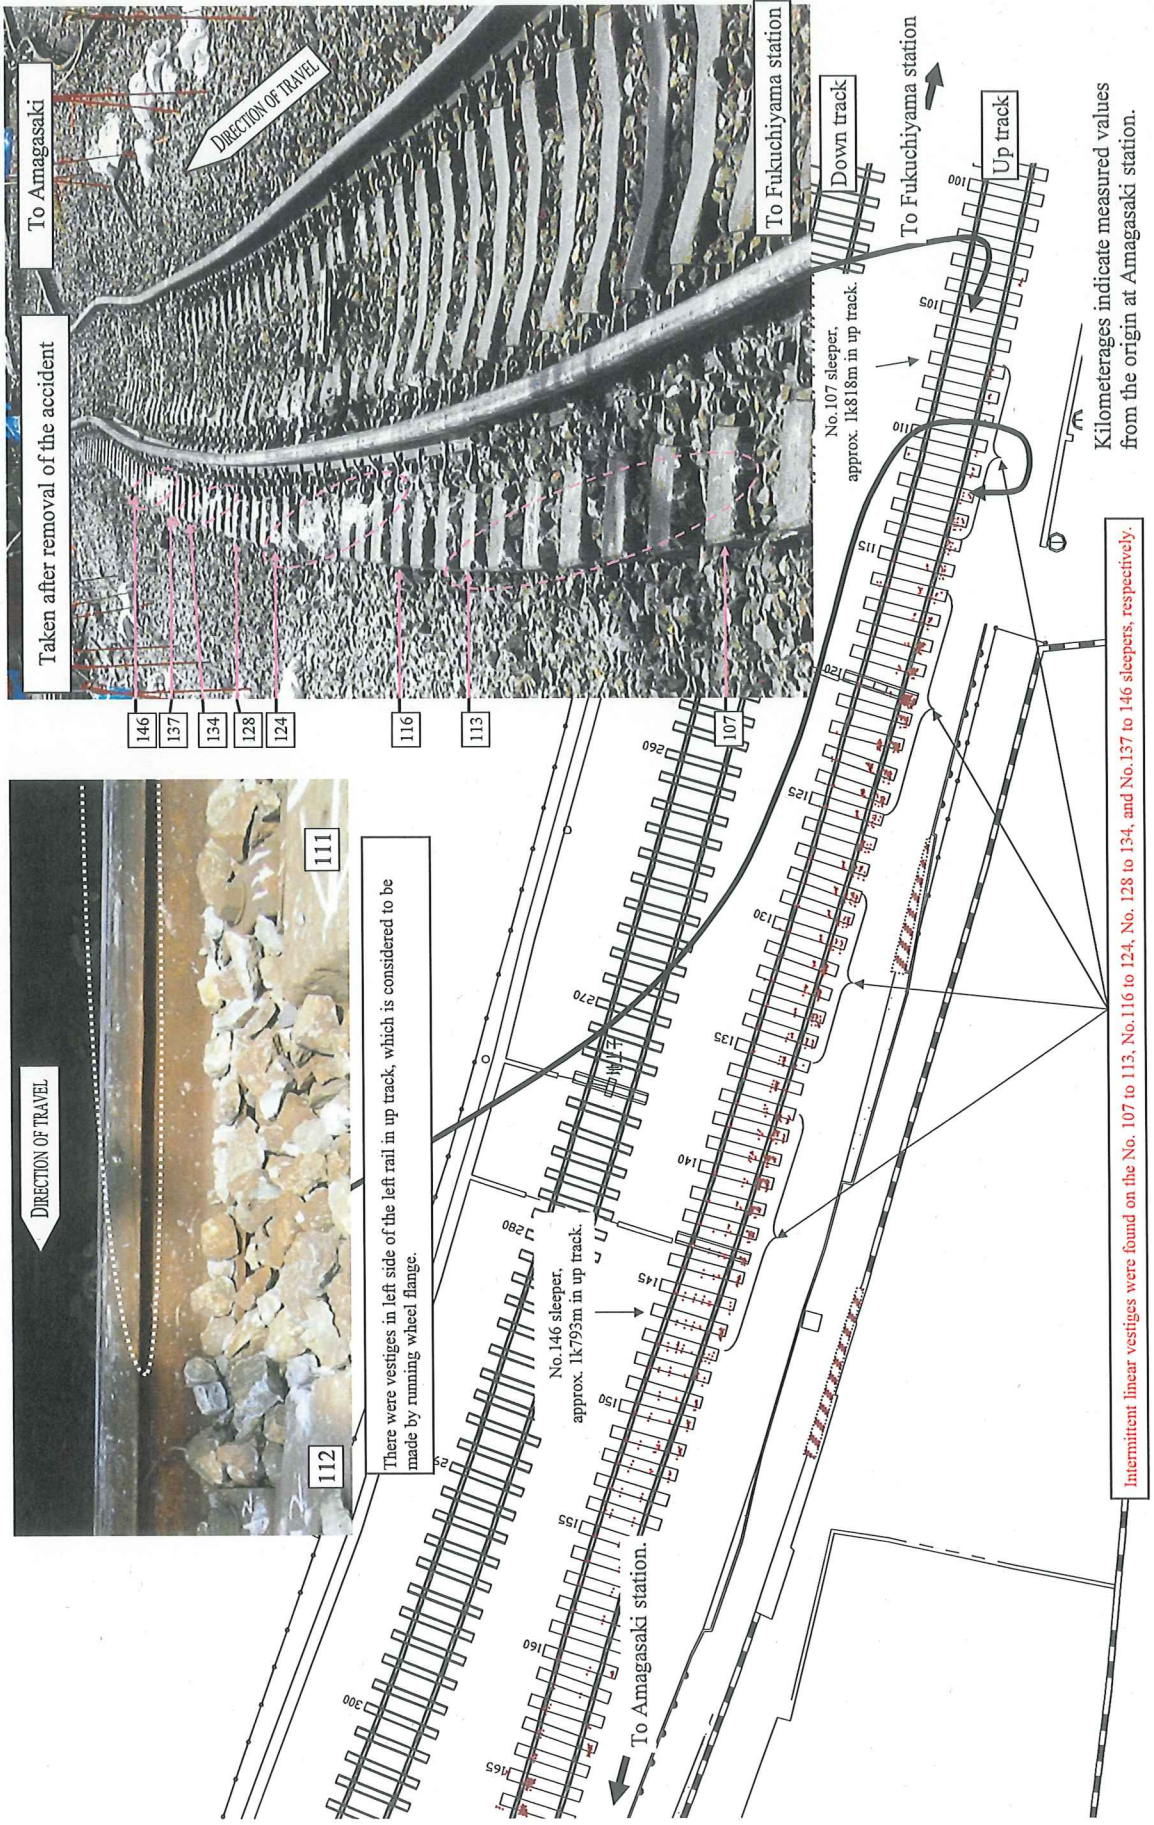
States of Damage to Railway Facilities etc. (4) (Sleepers on the left rail side of the up track, 1/3)
